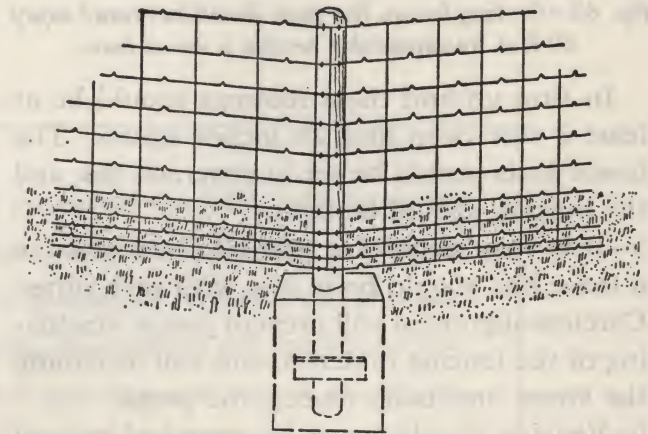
When posts must be placed in a depression, set in concrete to prevent pulling. Drainage should be provided even though posts are treated
